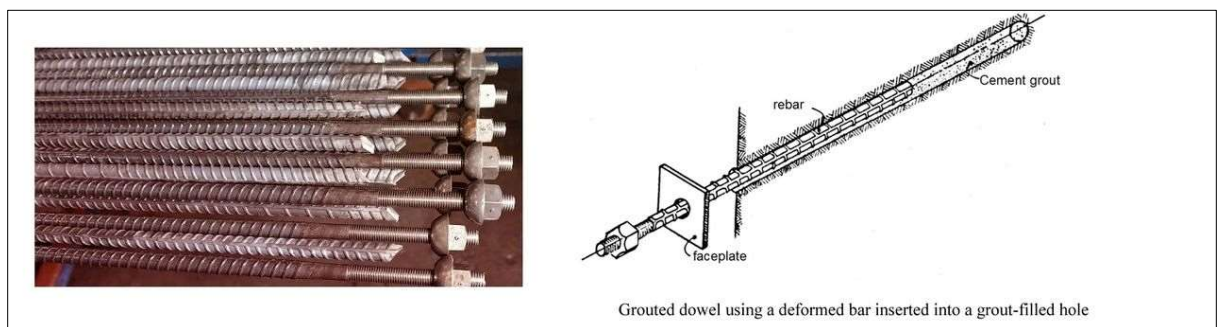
Fully Grouted rebar bolt. (Reference: Geotechnical Designs website)
